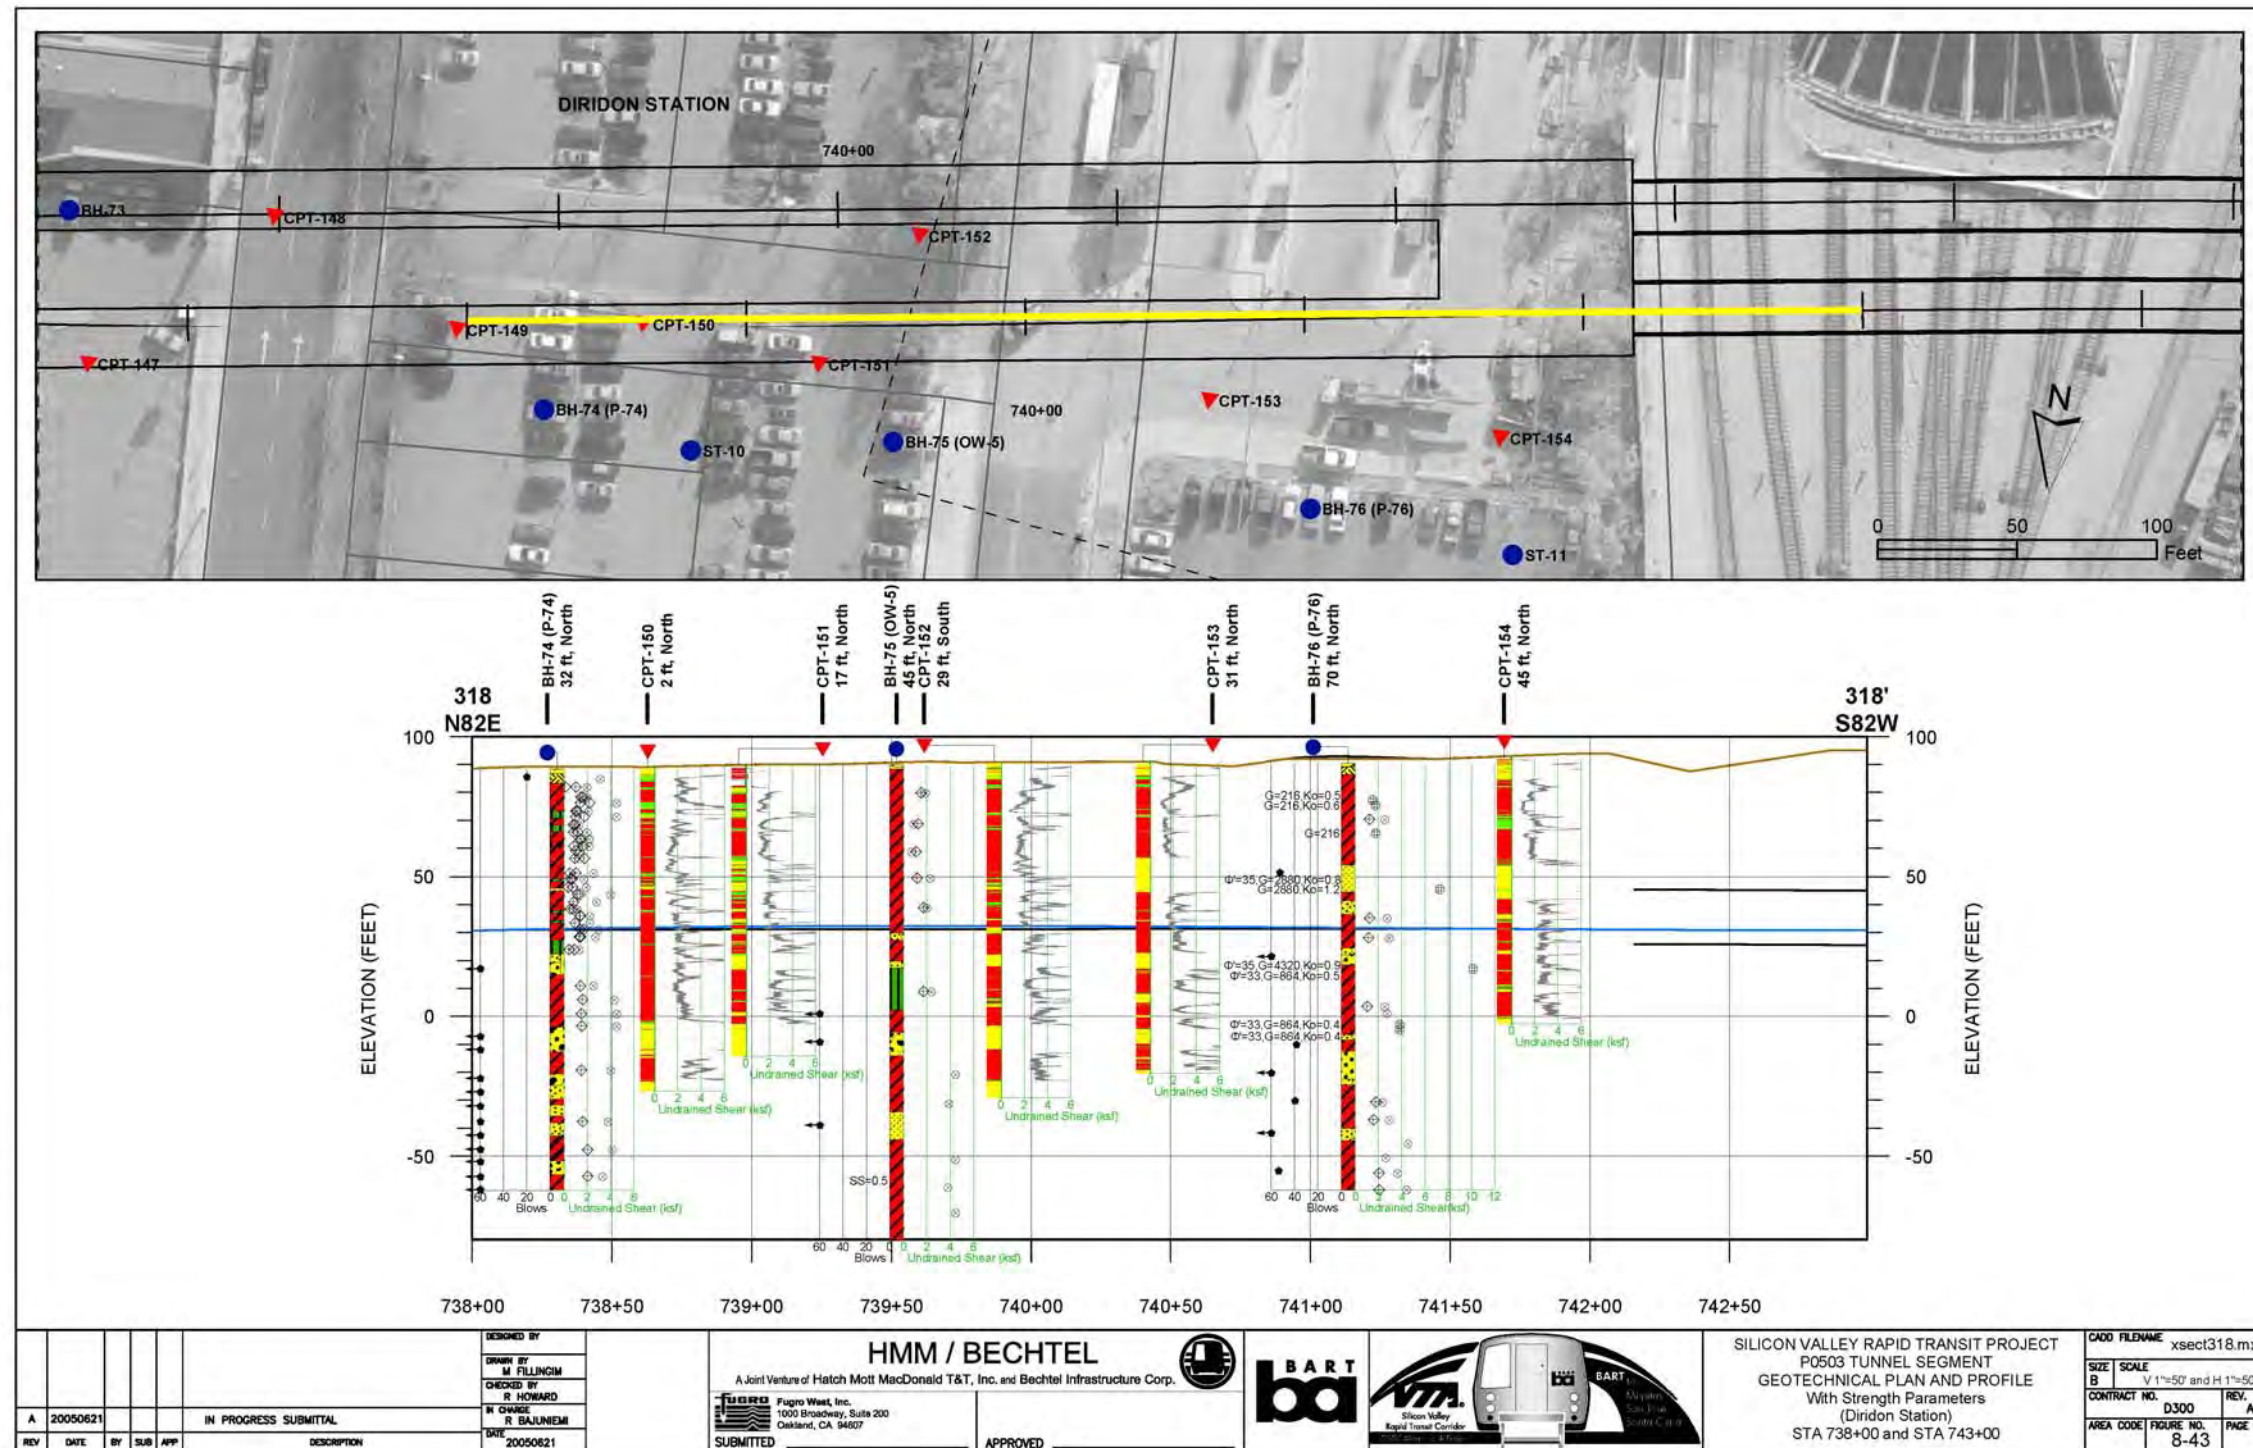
Geotechnical Plan and Profile with Strength Parameters: 738+00 to 743+00.
